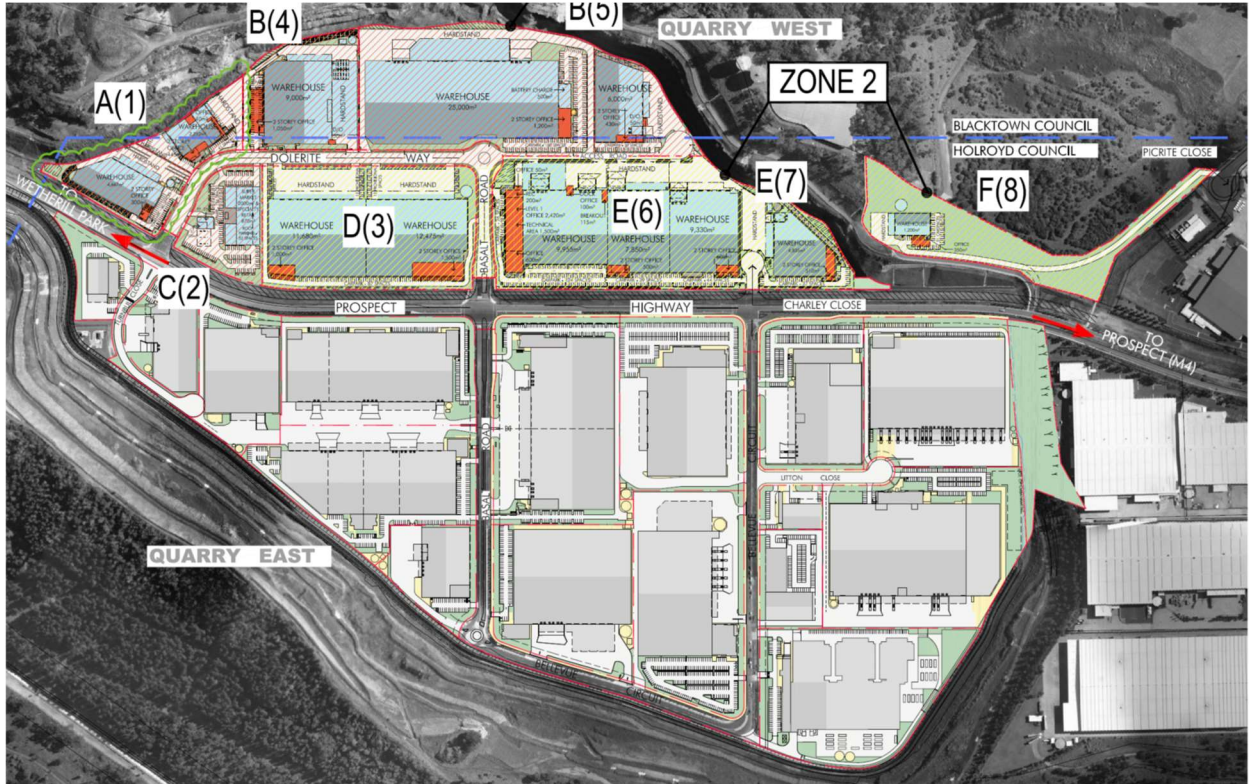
QuarryWEST Masterplan – As Currently Approved (Source: Nettleton Tribe)
